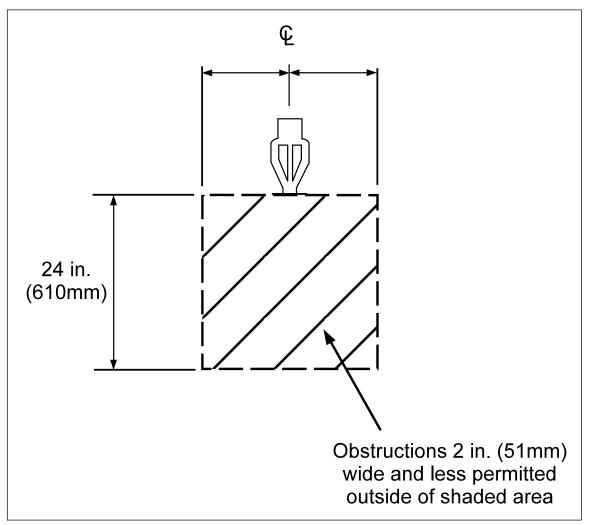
Obstructions below sprinklers no wider than 2.0 in. (51 mm).
